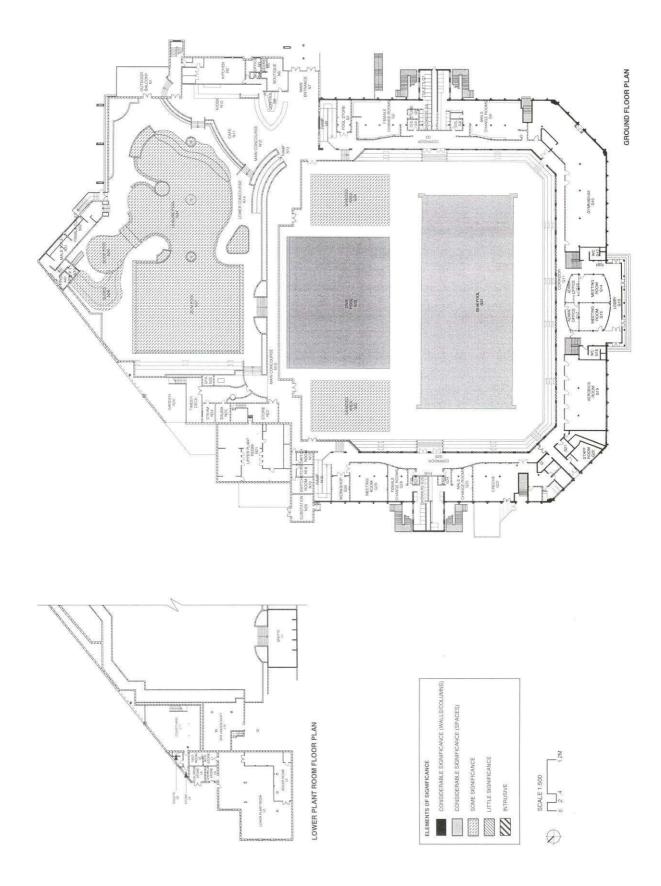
Beatty Park Leisure Centre – Ground Floor Plan (Elements of Significance).
